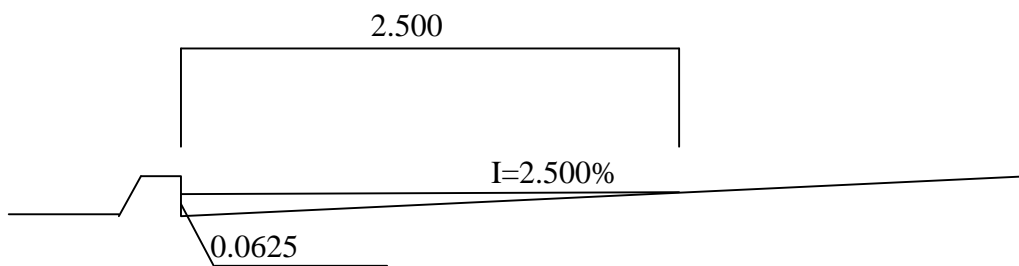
Section of Ramp Drainage Facility (Asphalt Concrete Curb)
